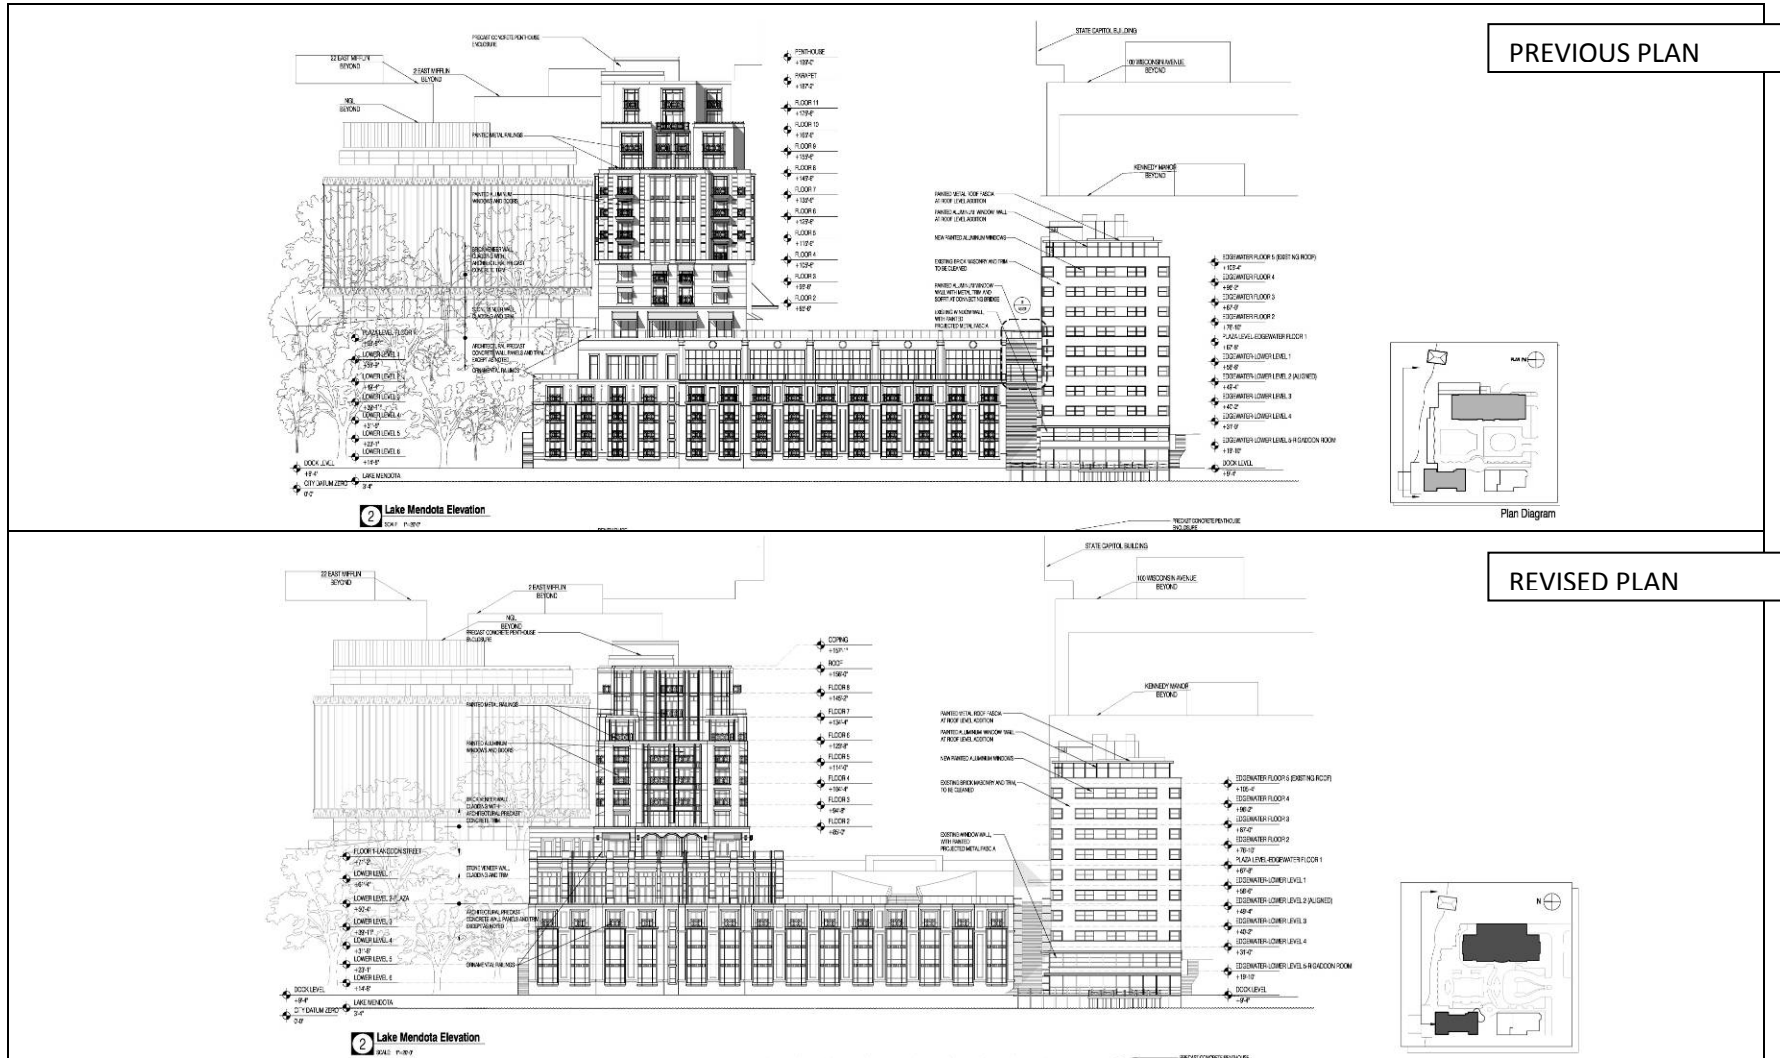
Previous Lakefront Elevation as Compared to Revised Lakefront Elevation
